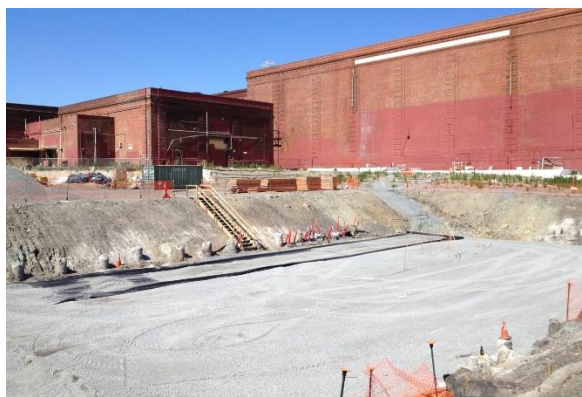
Potrero Switchyard site prep completed, June 16, 2015
